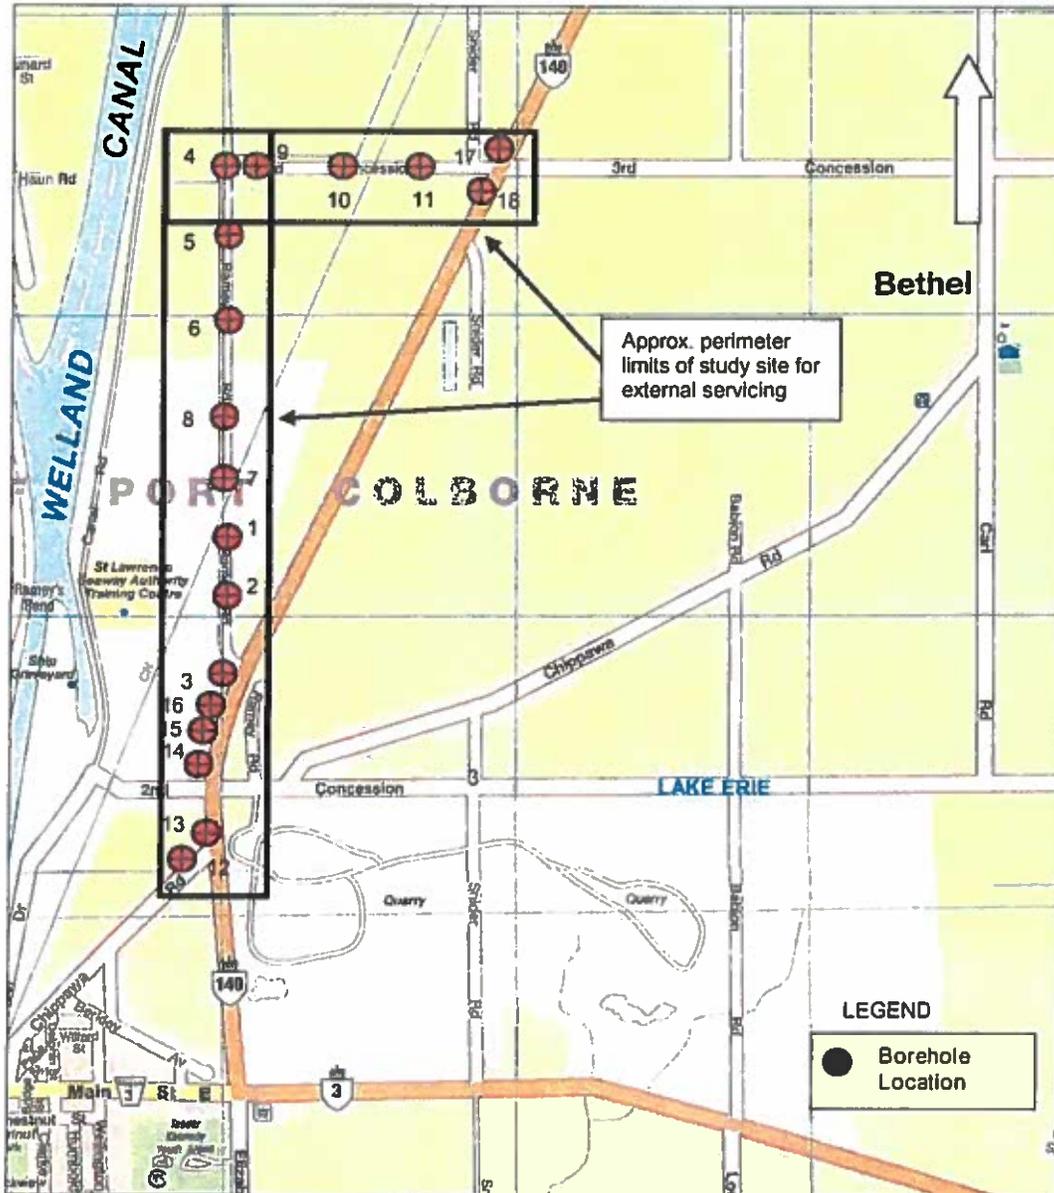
Key Location Plan of Subject Site and Borehole Locations
